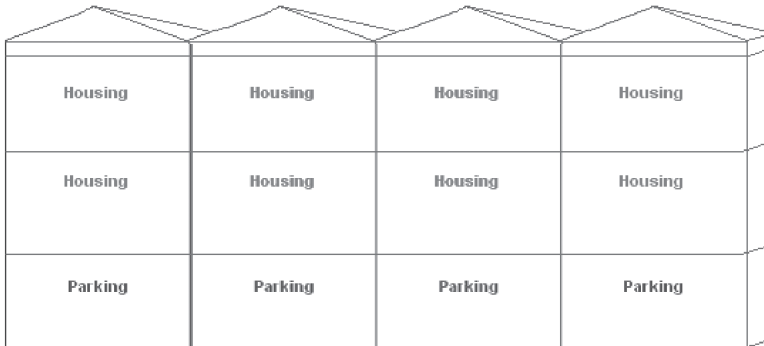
Three storey town house development that shares a common wall and has parking bay on the ground floor
